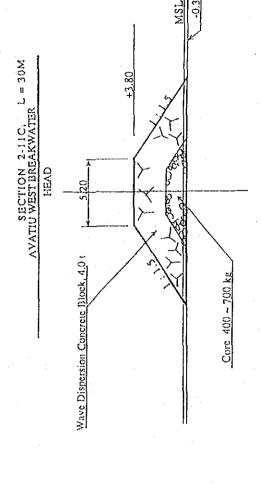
Typical Section: Avatiu Harbour (2/5)
